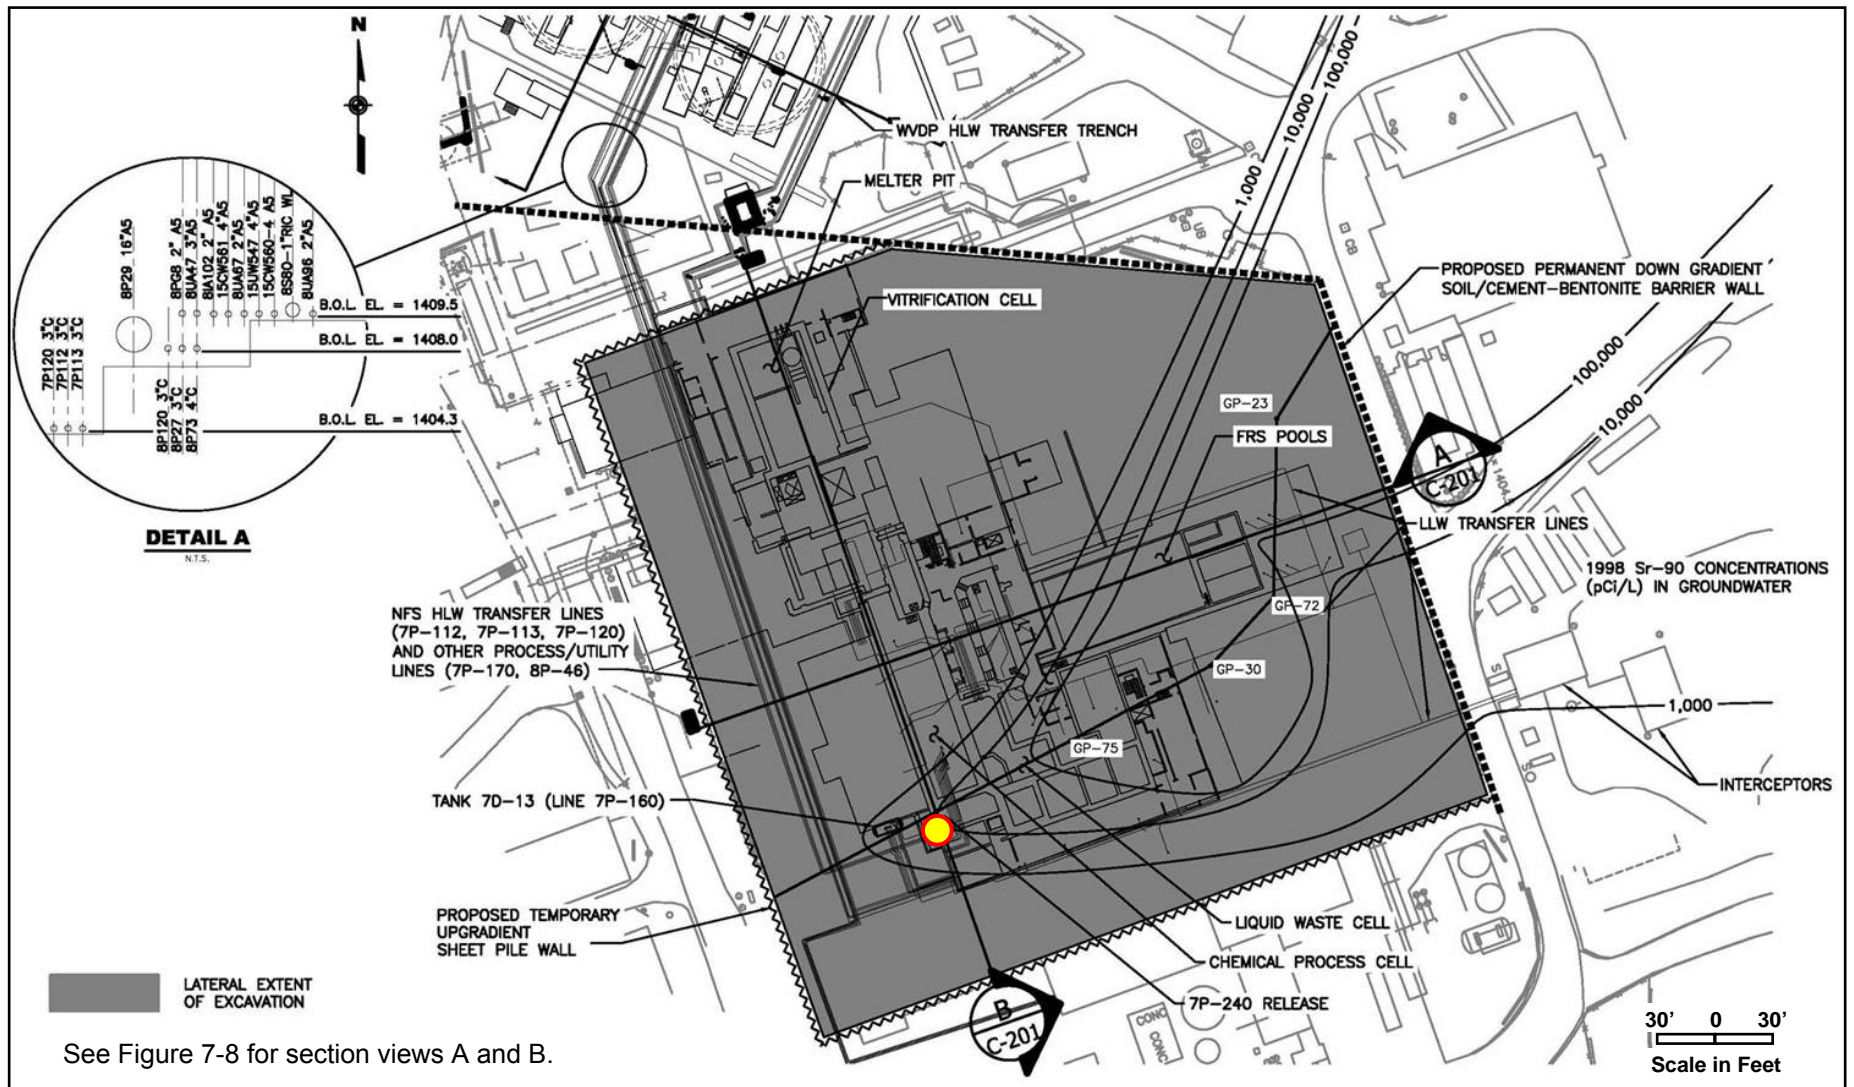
Conceptual Layout of WMA 1 Excavation
